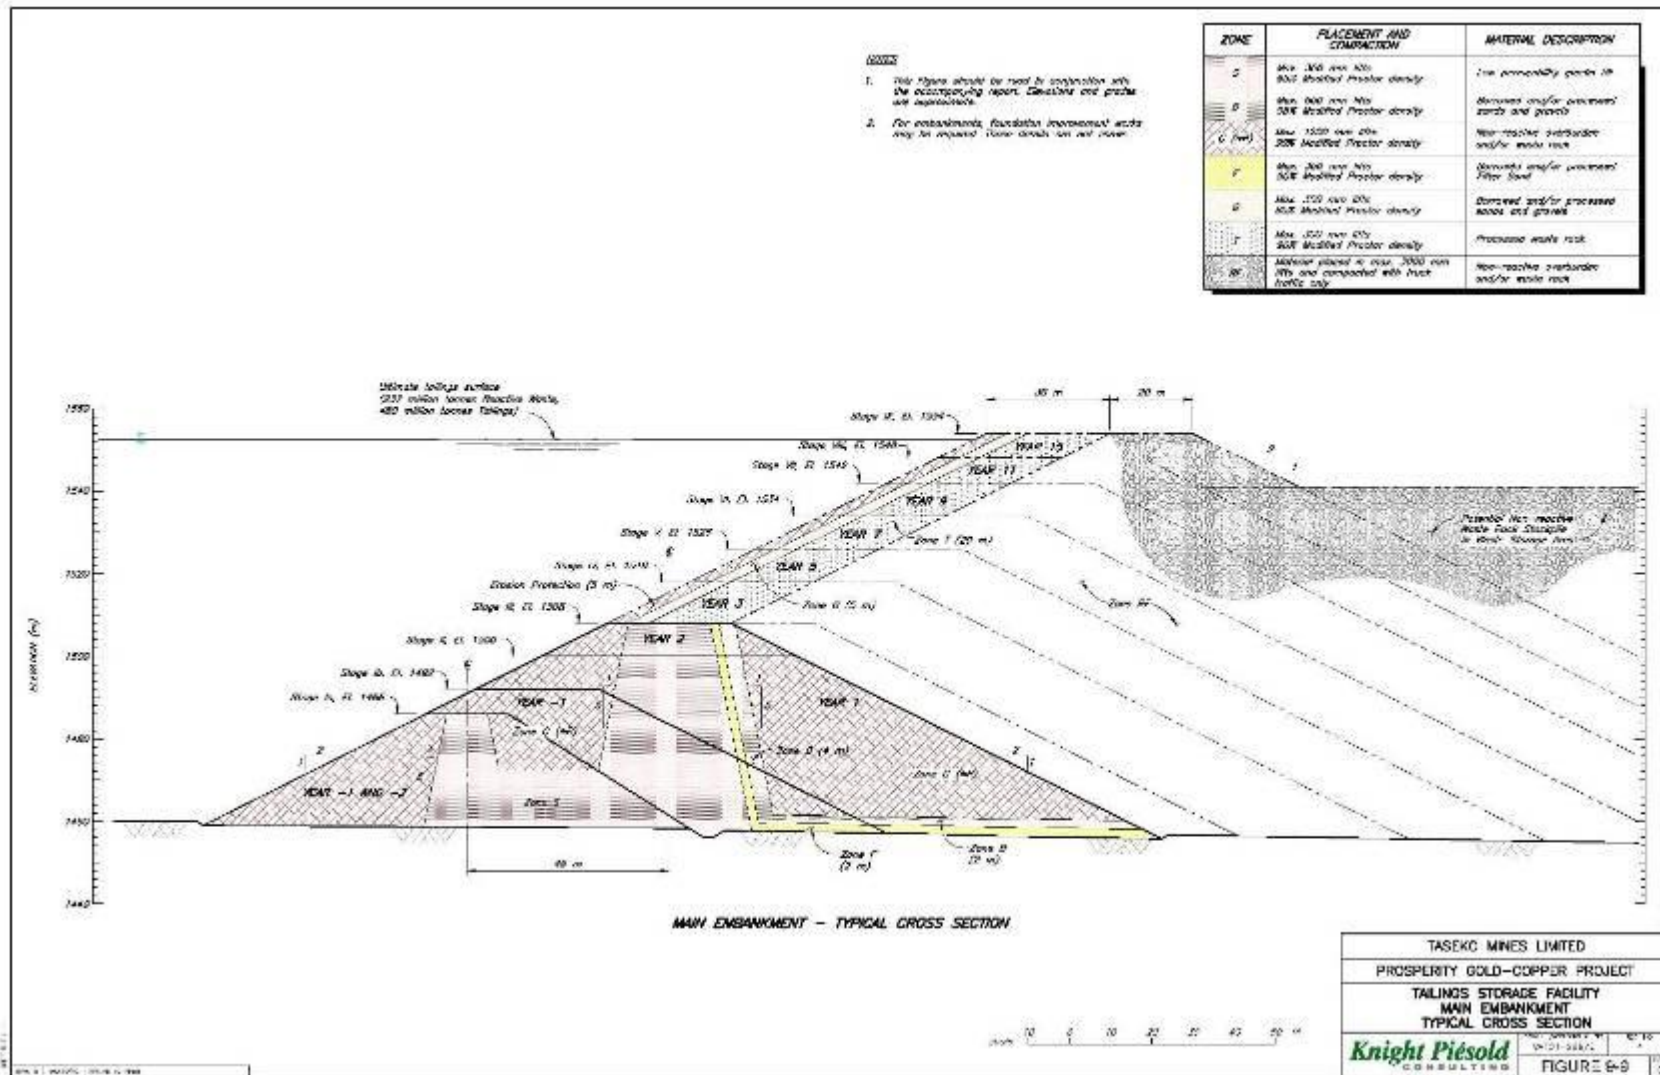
Tailings Storage Facility–Main Embankment Typical Cross Section
